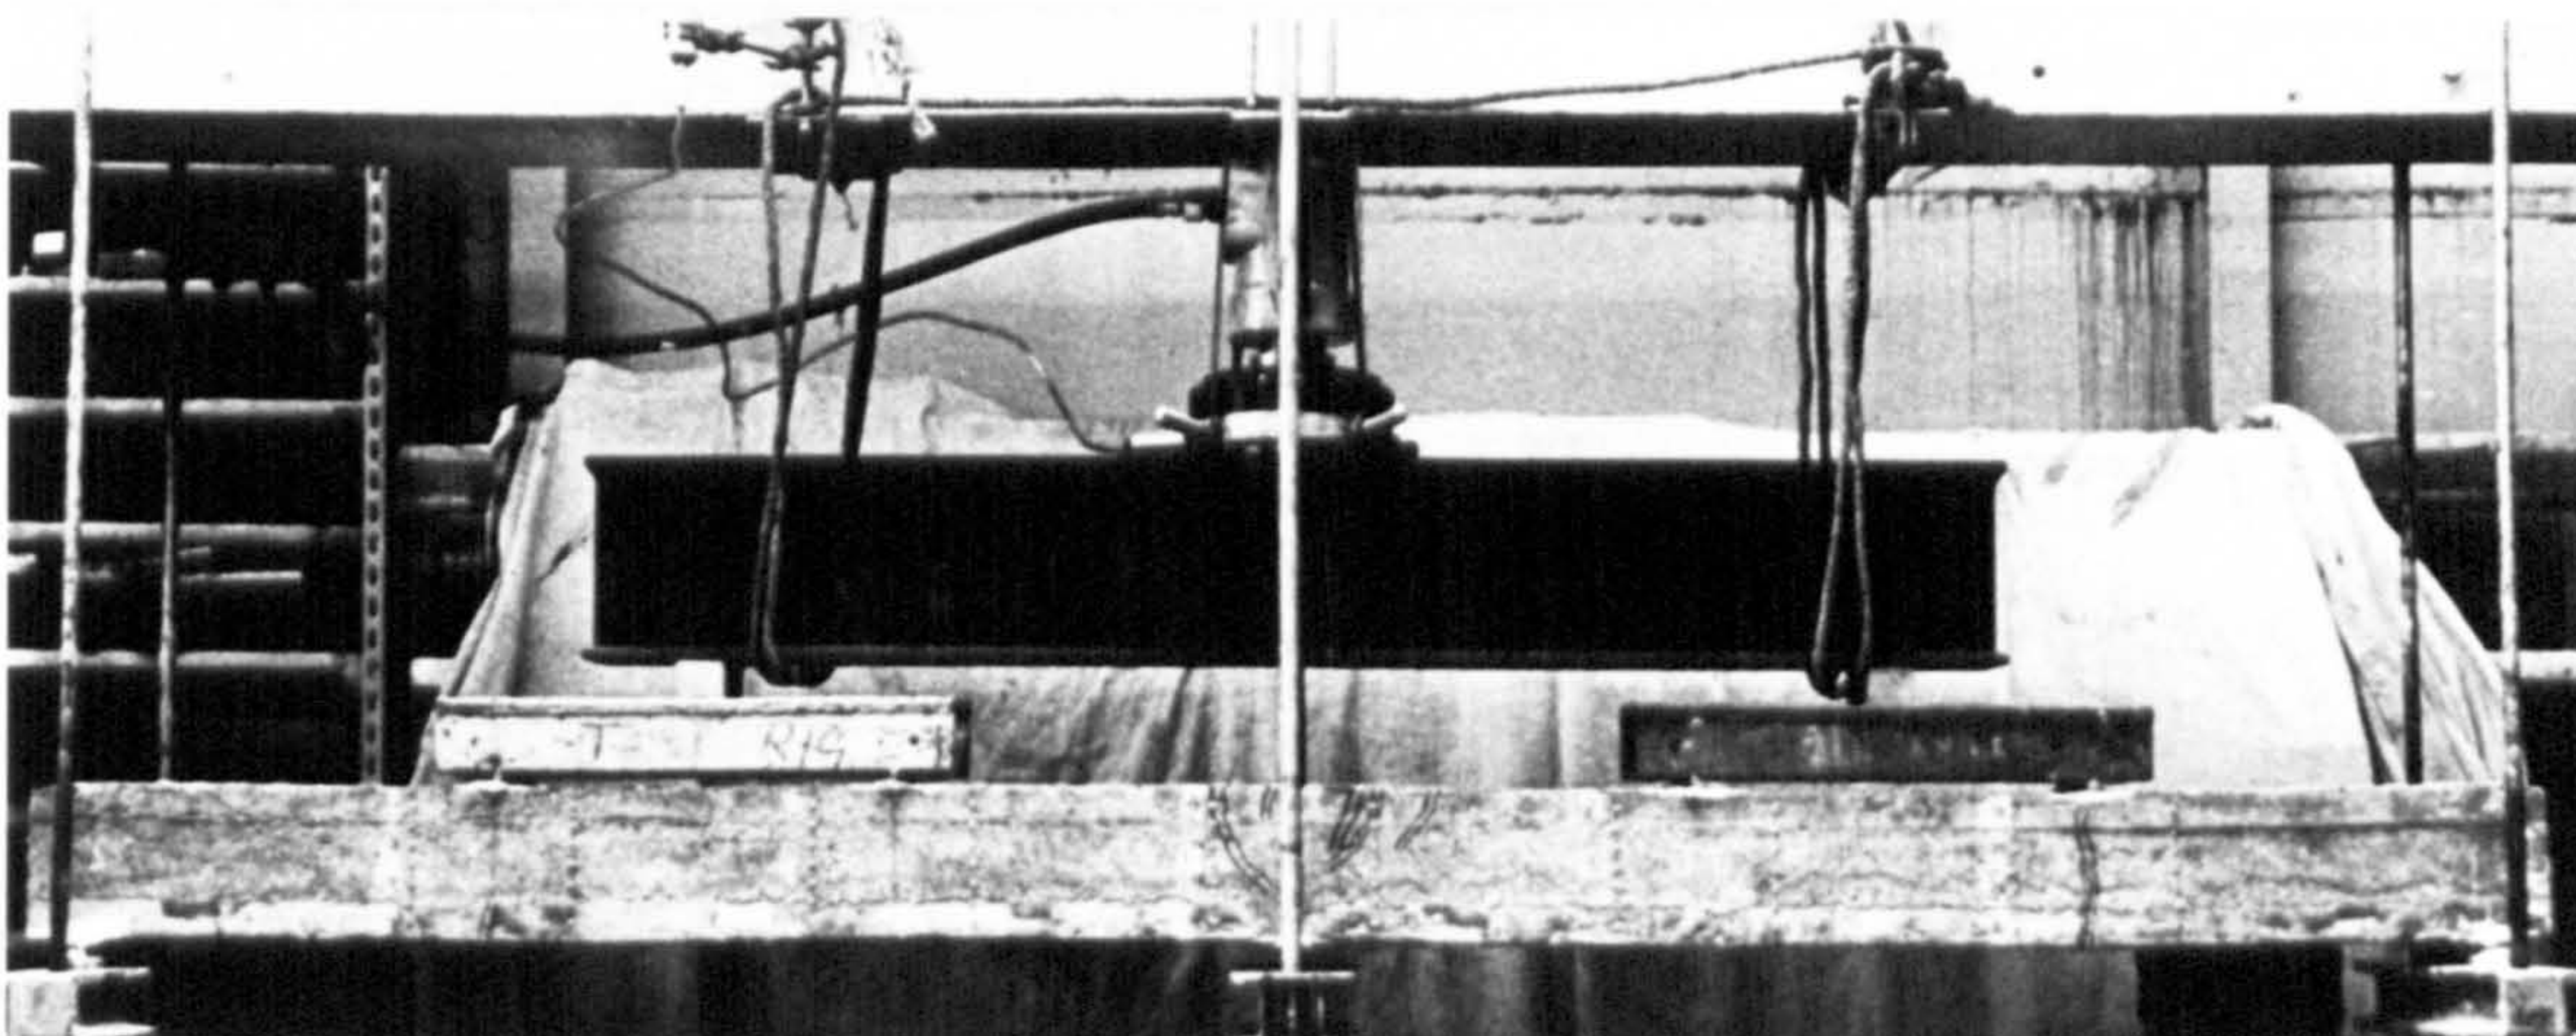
Composite prestressed concrete continuous beam on testing rig after failure
